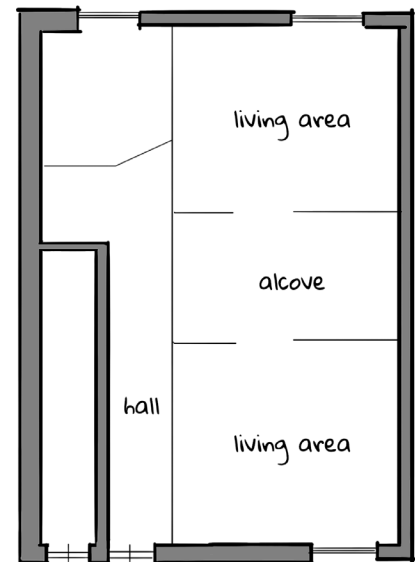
Systematic floor plan of alkoofwoning. Own image (with inspiration from Rotterdam woont, n.d.-a)
